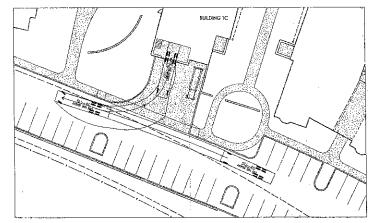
BUILDING 1C LOADING DOCK (BOX TRUCK)
